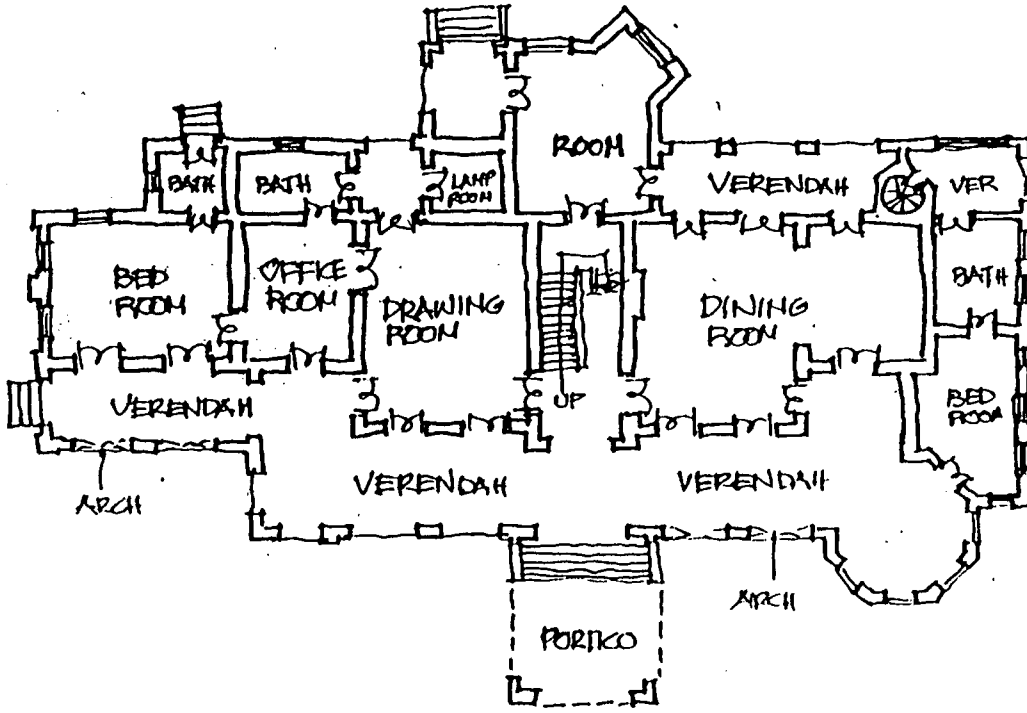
Ground floor plan, bungalow no-20, Ramna colony, Dhaka
